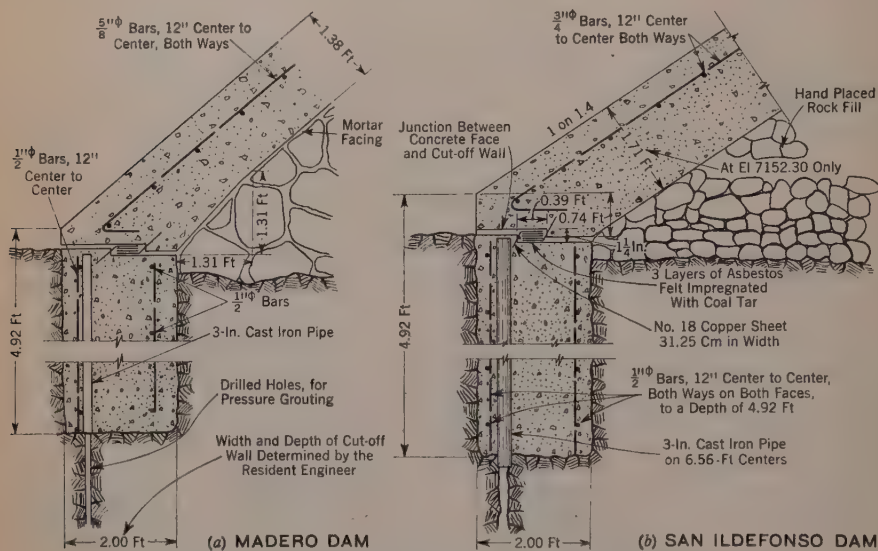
TYPICAL DETAILS AT CUT-OFF WALL
